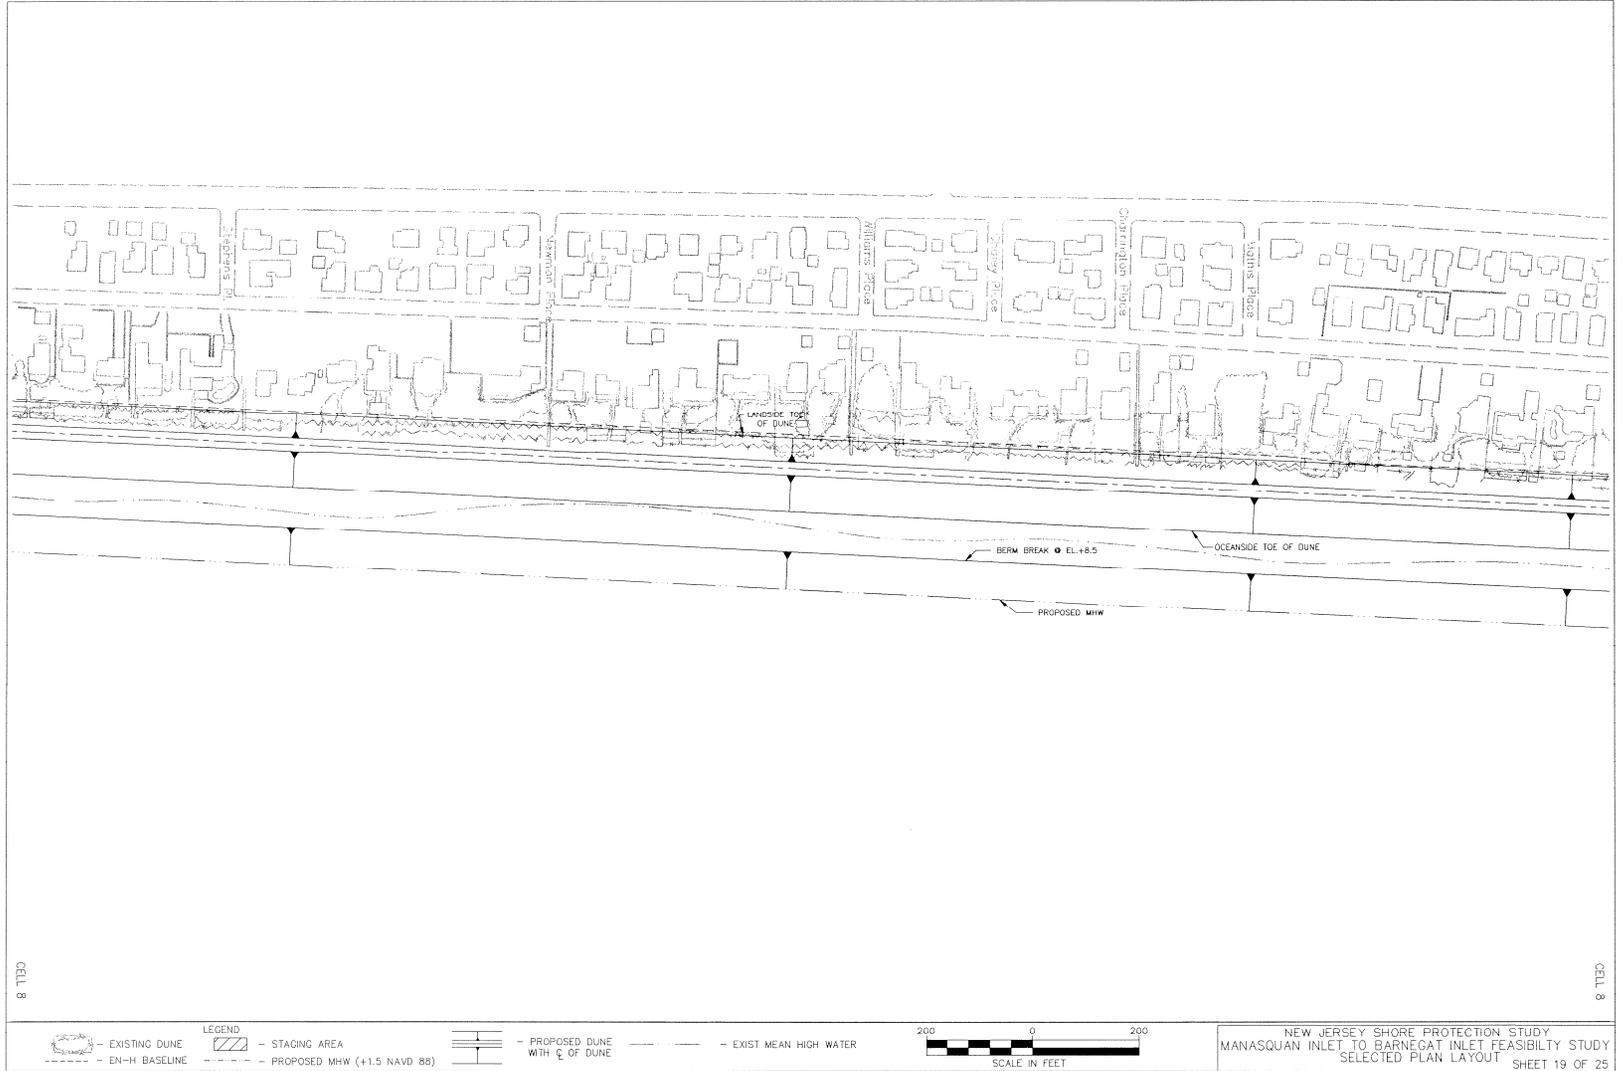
Selected Plan Layout – Mantoloking Borough, South of Stephens Place to North of Mathis Place
